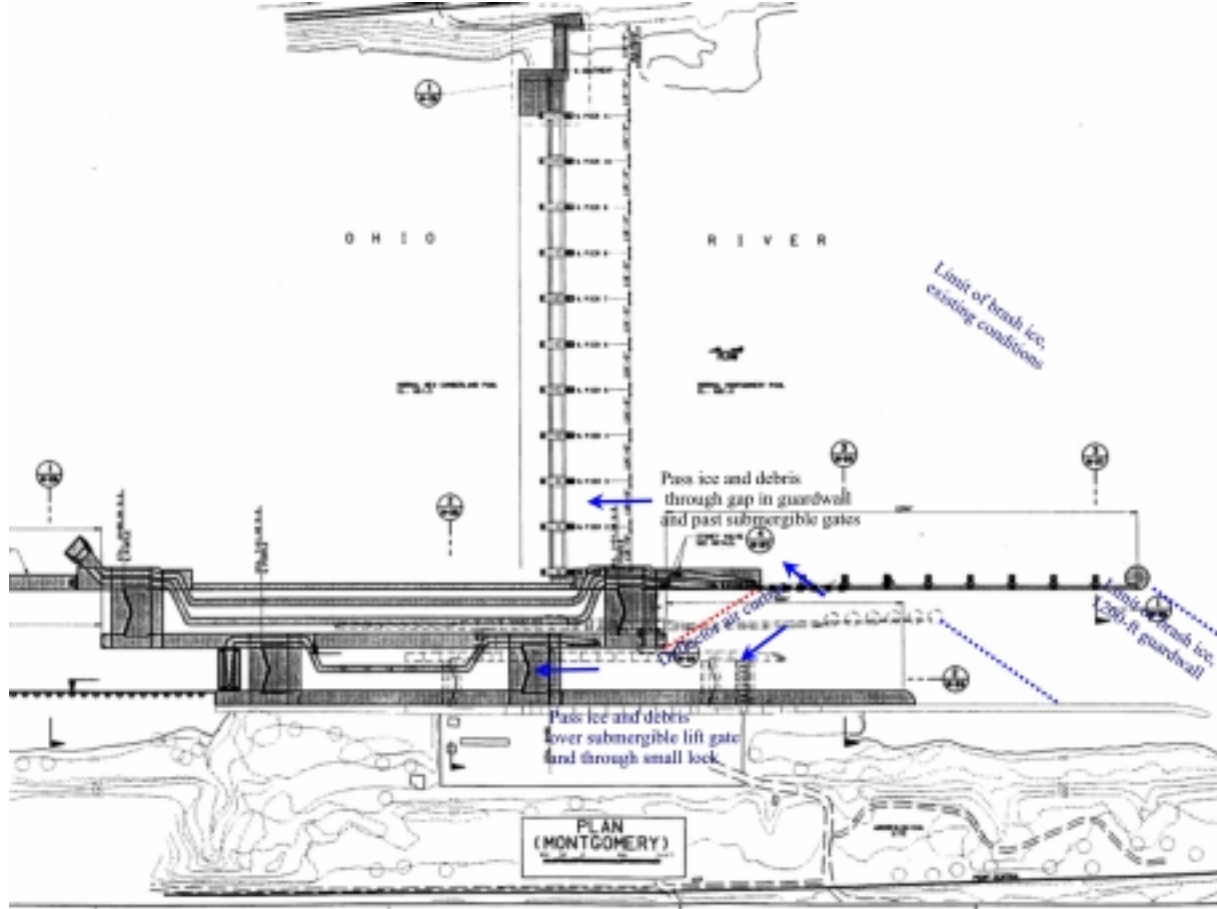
Plan view sketch of existing and proposed new locks at Montgomery Lock & Dam.
